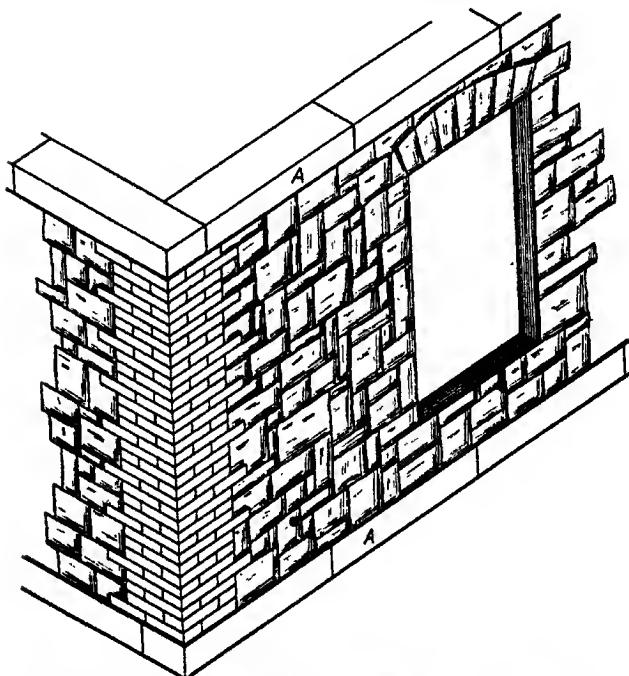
Ashlar, or dressed stone wall, with string courses, (A), window opening, and brick corner.
